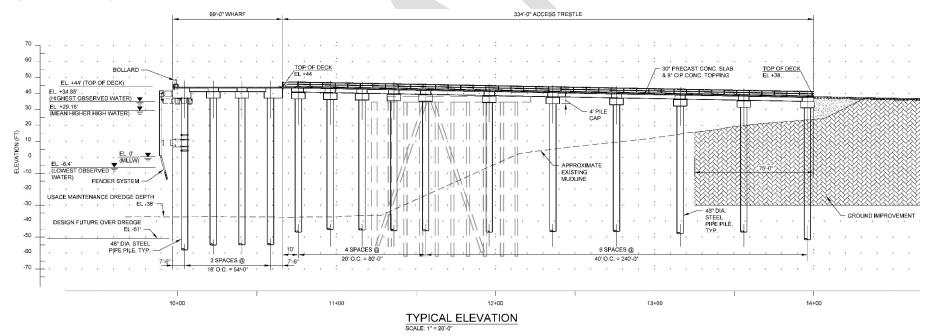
Longitudinal Elevation for Terminal 2 Access Trestle: Alternative 1A with 48-inch-diameter Driven Piles
